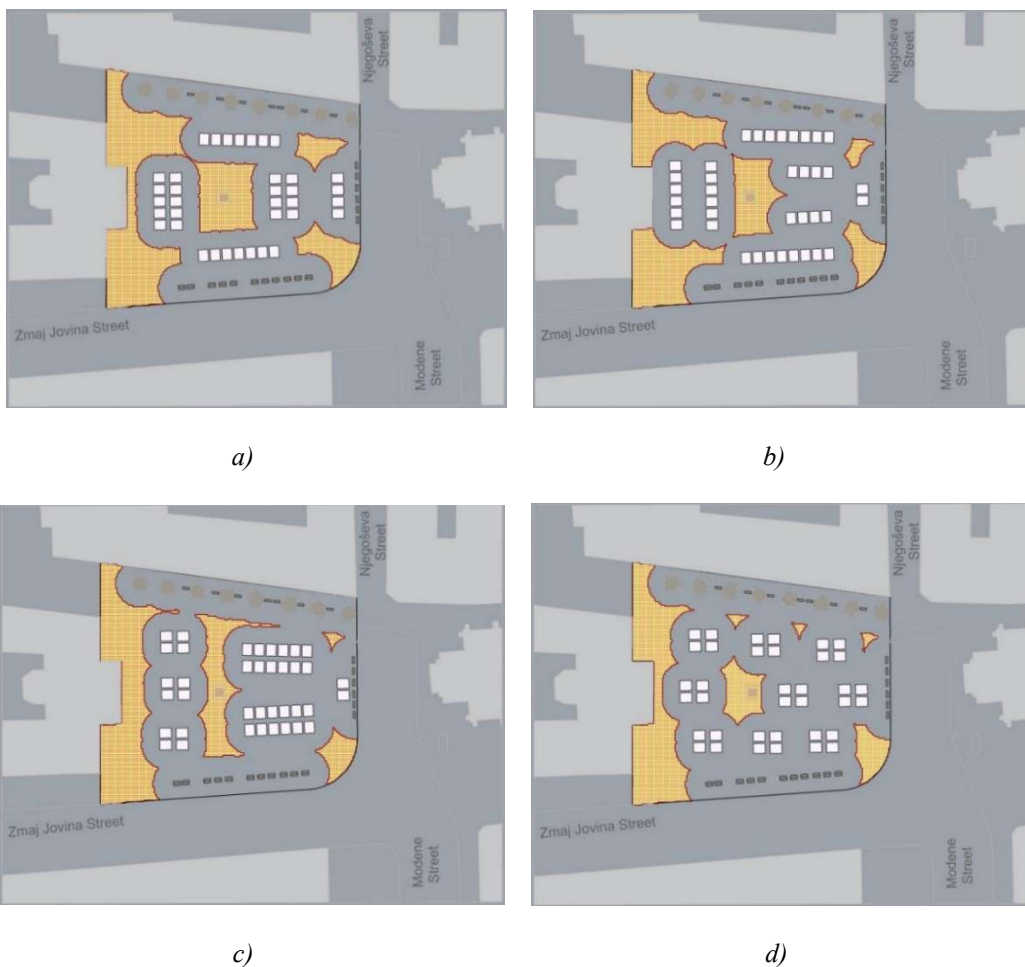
Display of the spatial configurations of standing areas for the following layouts of temporary structures: a) Layout 1 b) Layout 2 c) Layout 3 d) Layout 4
